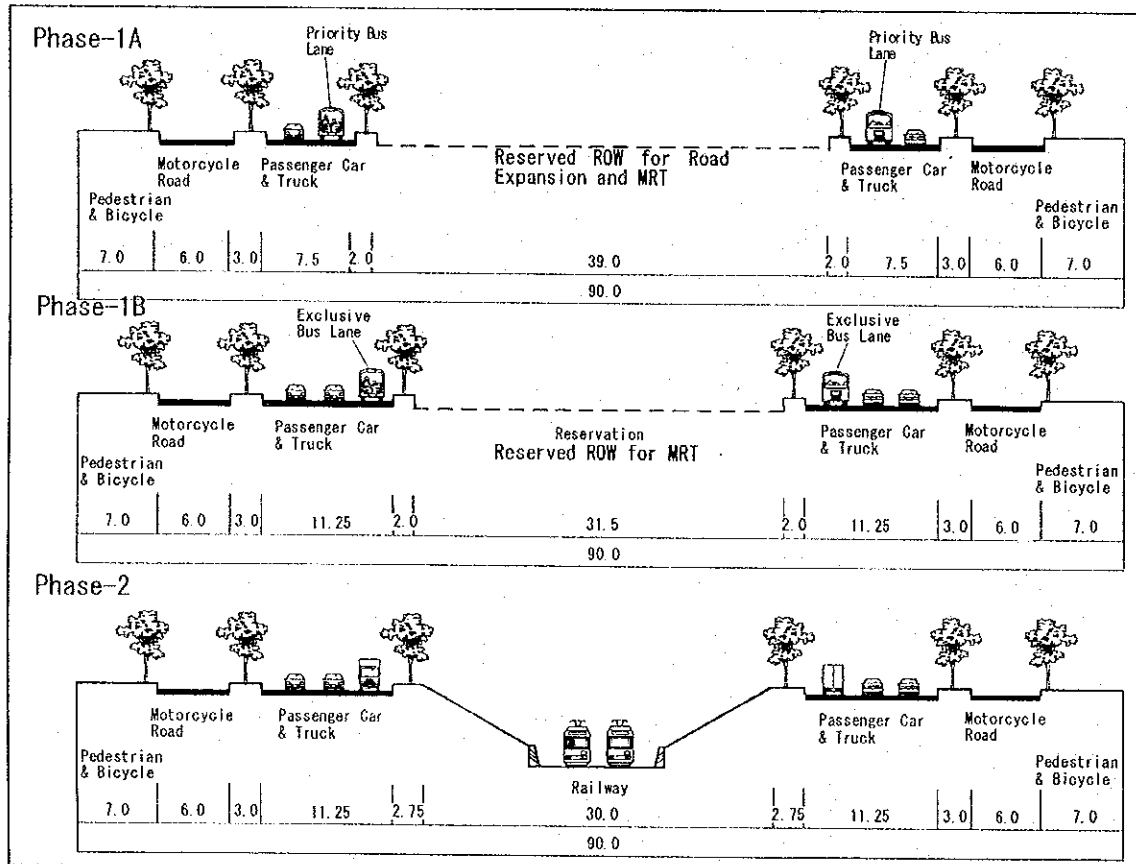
Typical Cross Section of staged Road Development: Lang-Hoa Lac
